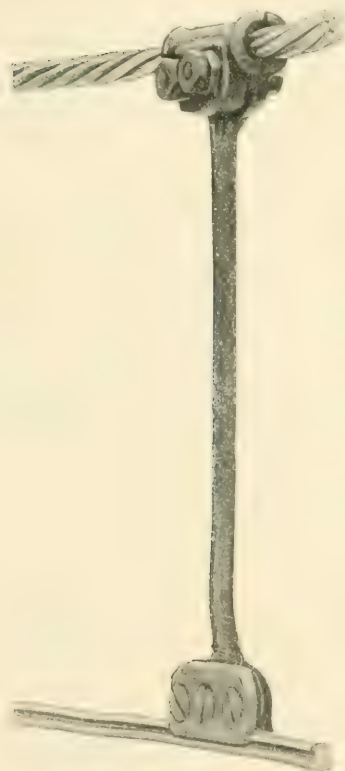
HANGER FOR SUPPORTING THE TROLLEY WIRE FROM THE MESSENGER CABLE
